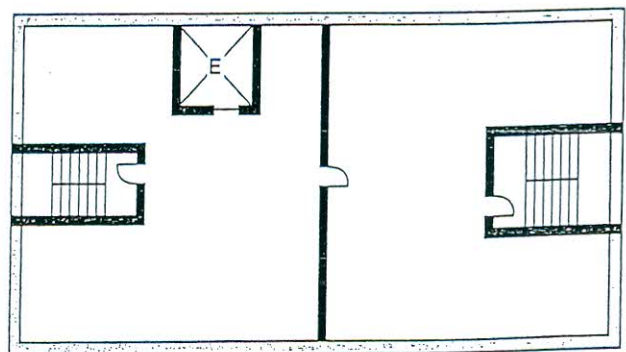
Areas of Refuge in Nonsprinklered New Construction
